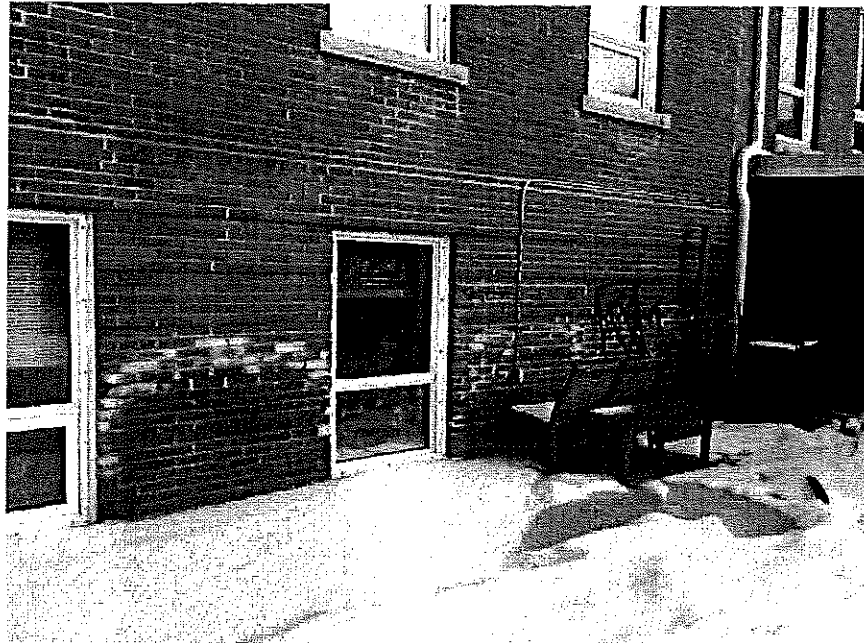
South façade where wicking up of moisture is evidenced by the efflorescence on the bricks
